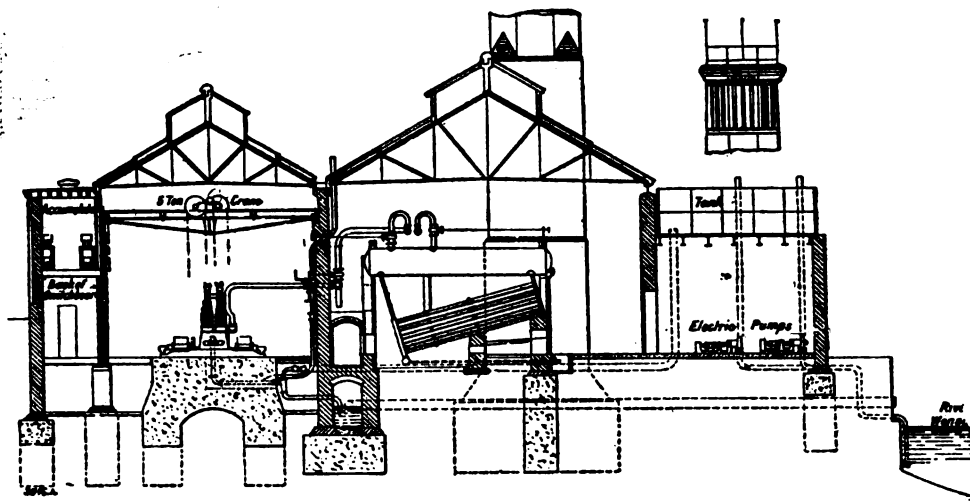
THE NORWICH, ENGLAND, ELECTRIC LIGHT STATION.—CROSS SECTION.
